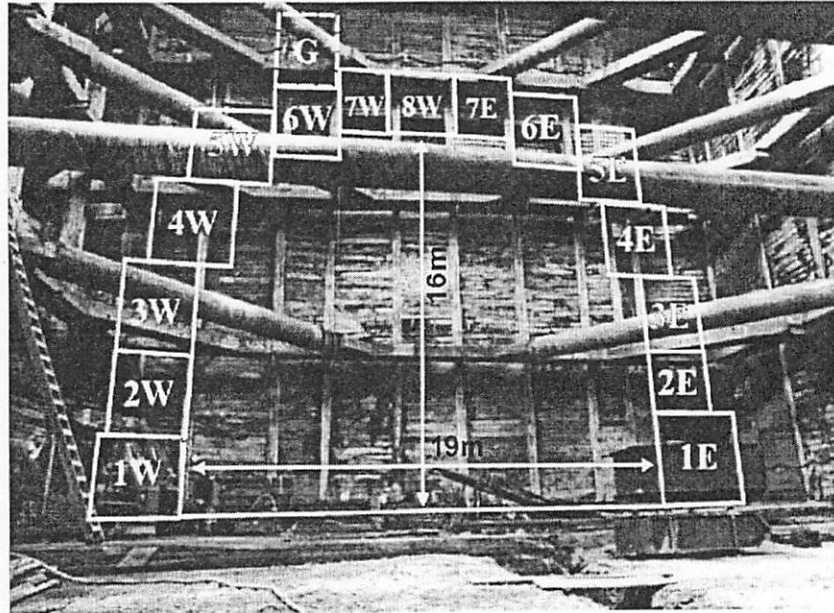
Stacked Drift Tunnel Viewed from South Shaft of the Río Piedras Station
